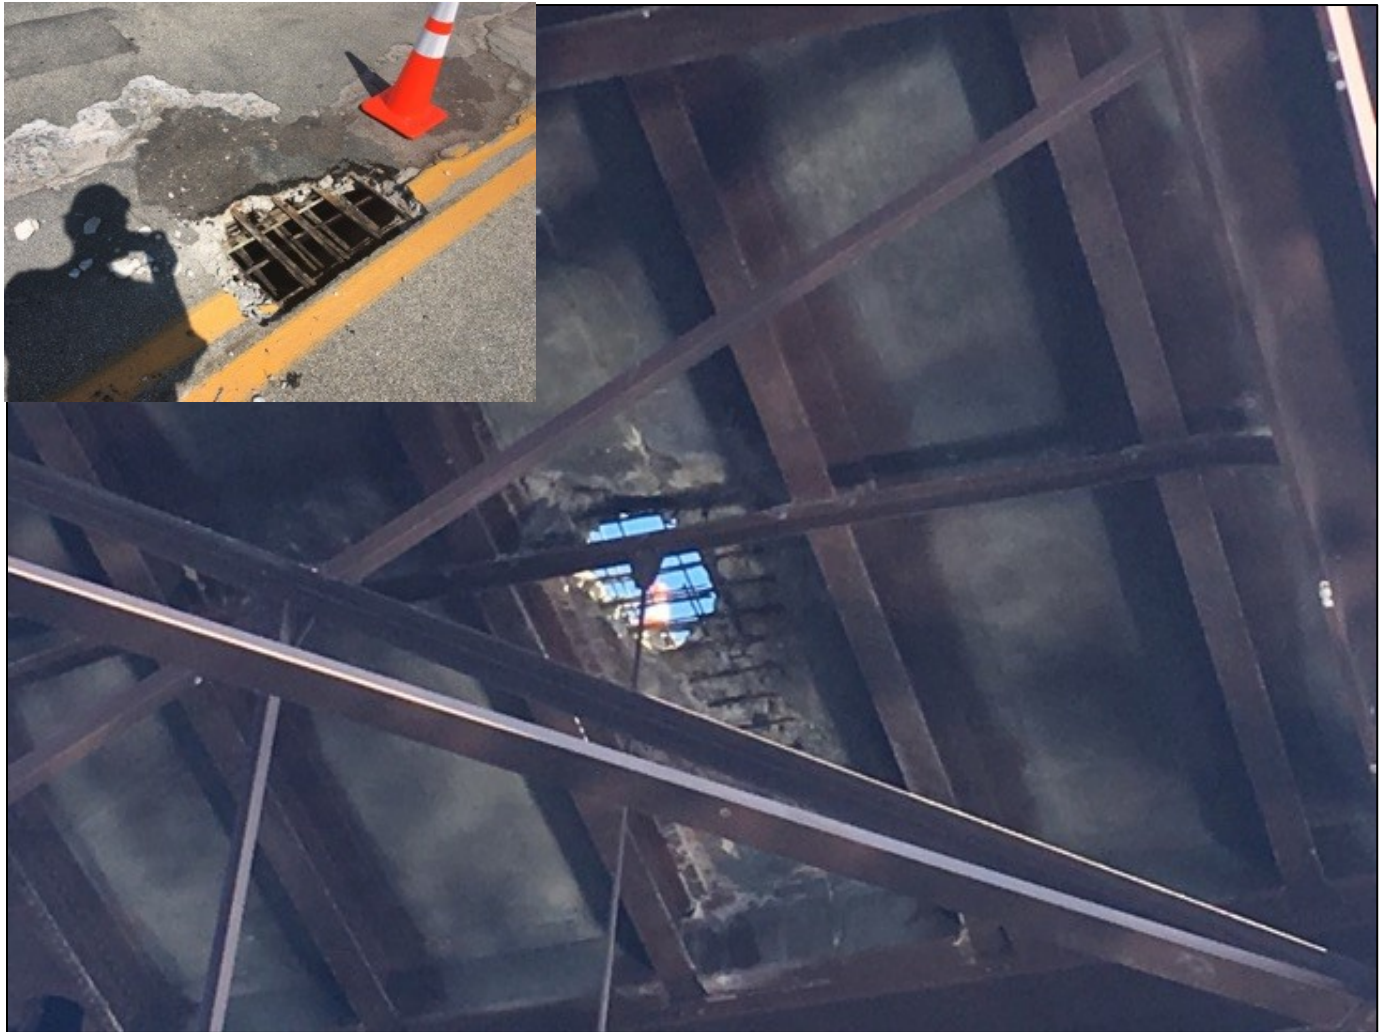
Punch-through deck failure at 1980 centerline construction joint that occurred in July 2017.
